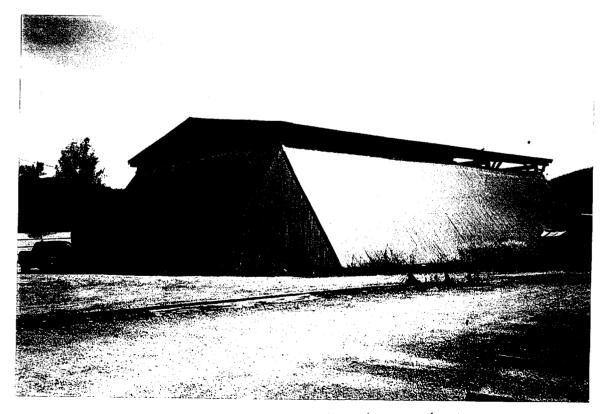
Raw Storage Building, south and west elevations, view to northeast
